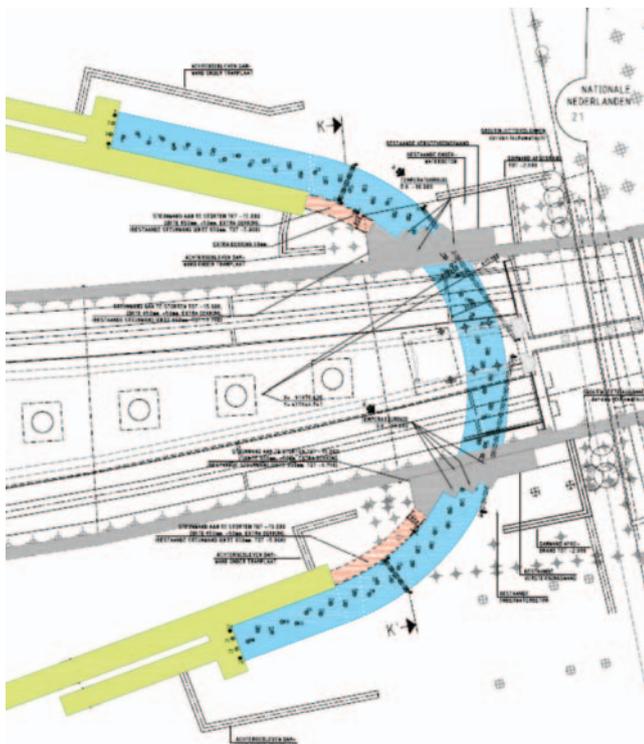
Plan of designed collar construction around the tunnel at station platform elevation, showing frozen soil area (blue) and supporting diaphragm walls (green). Distance between vertical freeze pipes is ca. 0.9 m.
